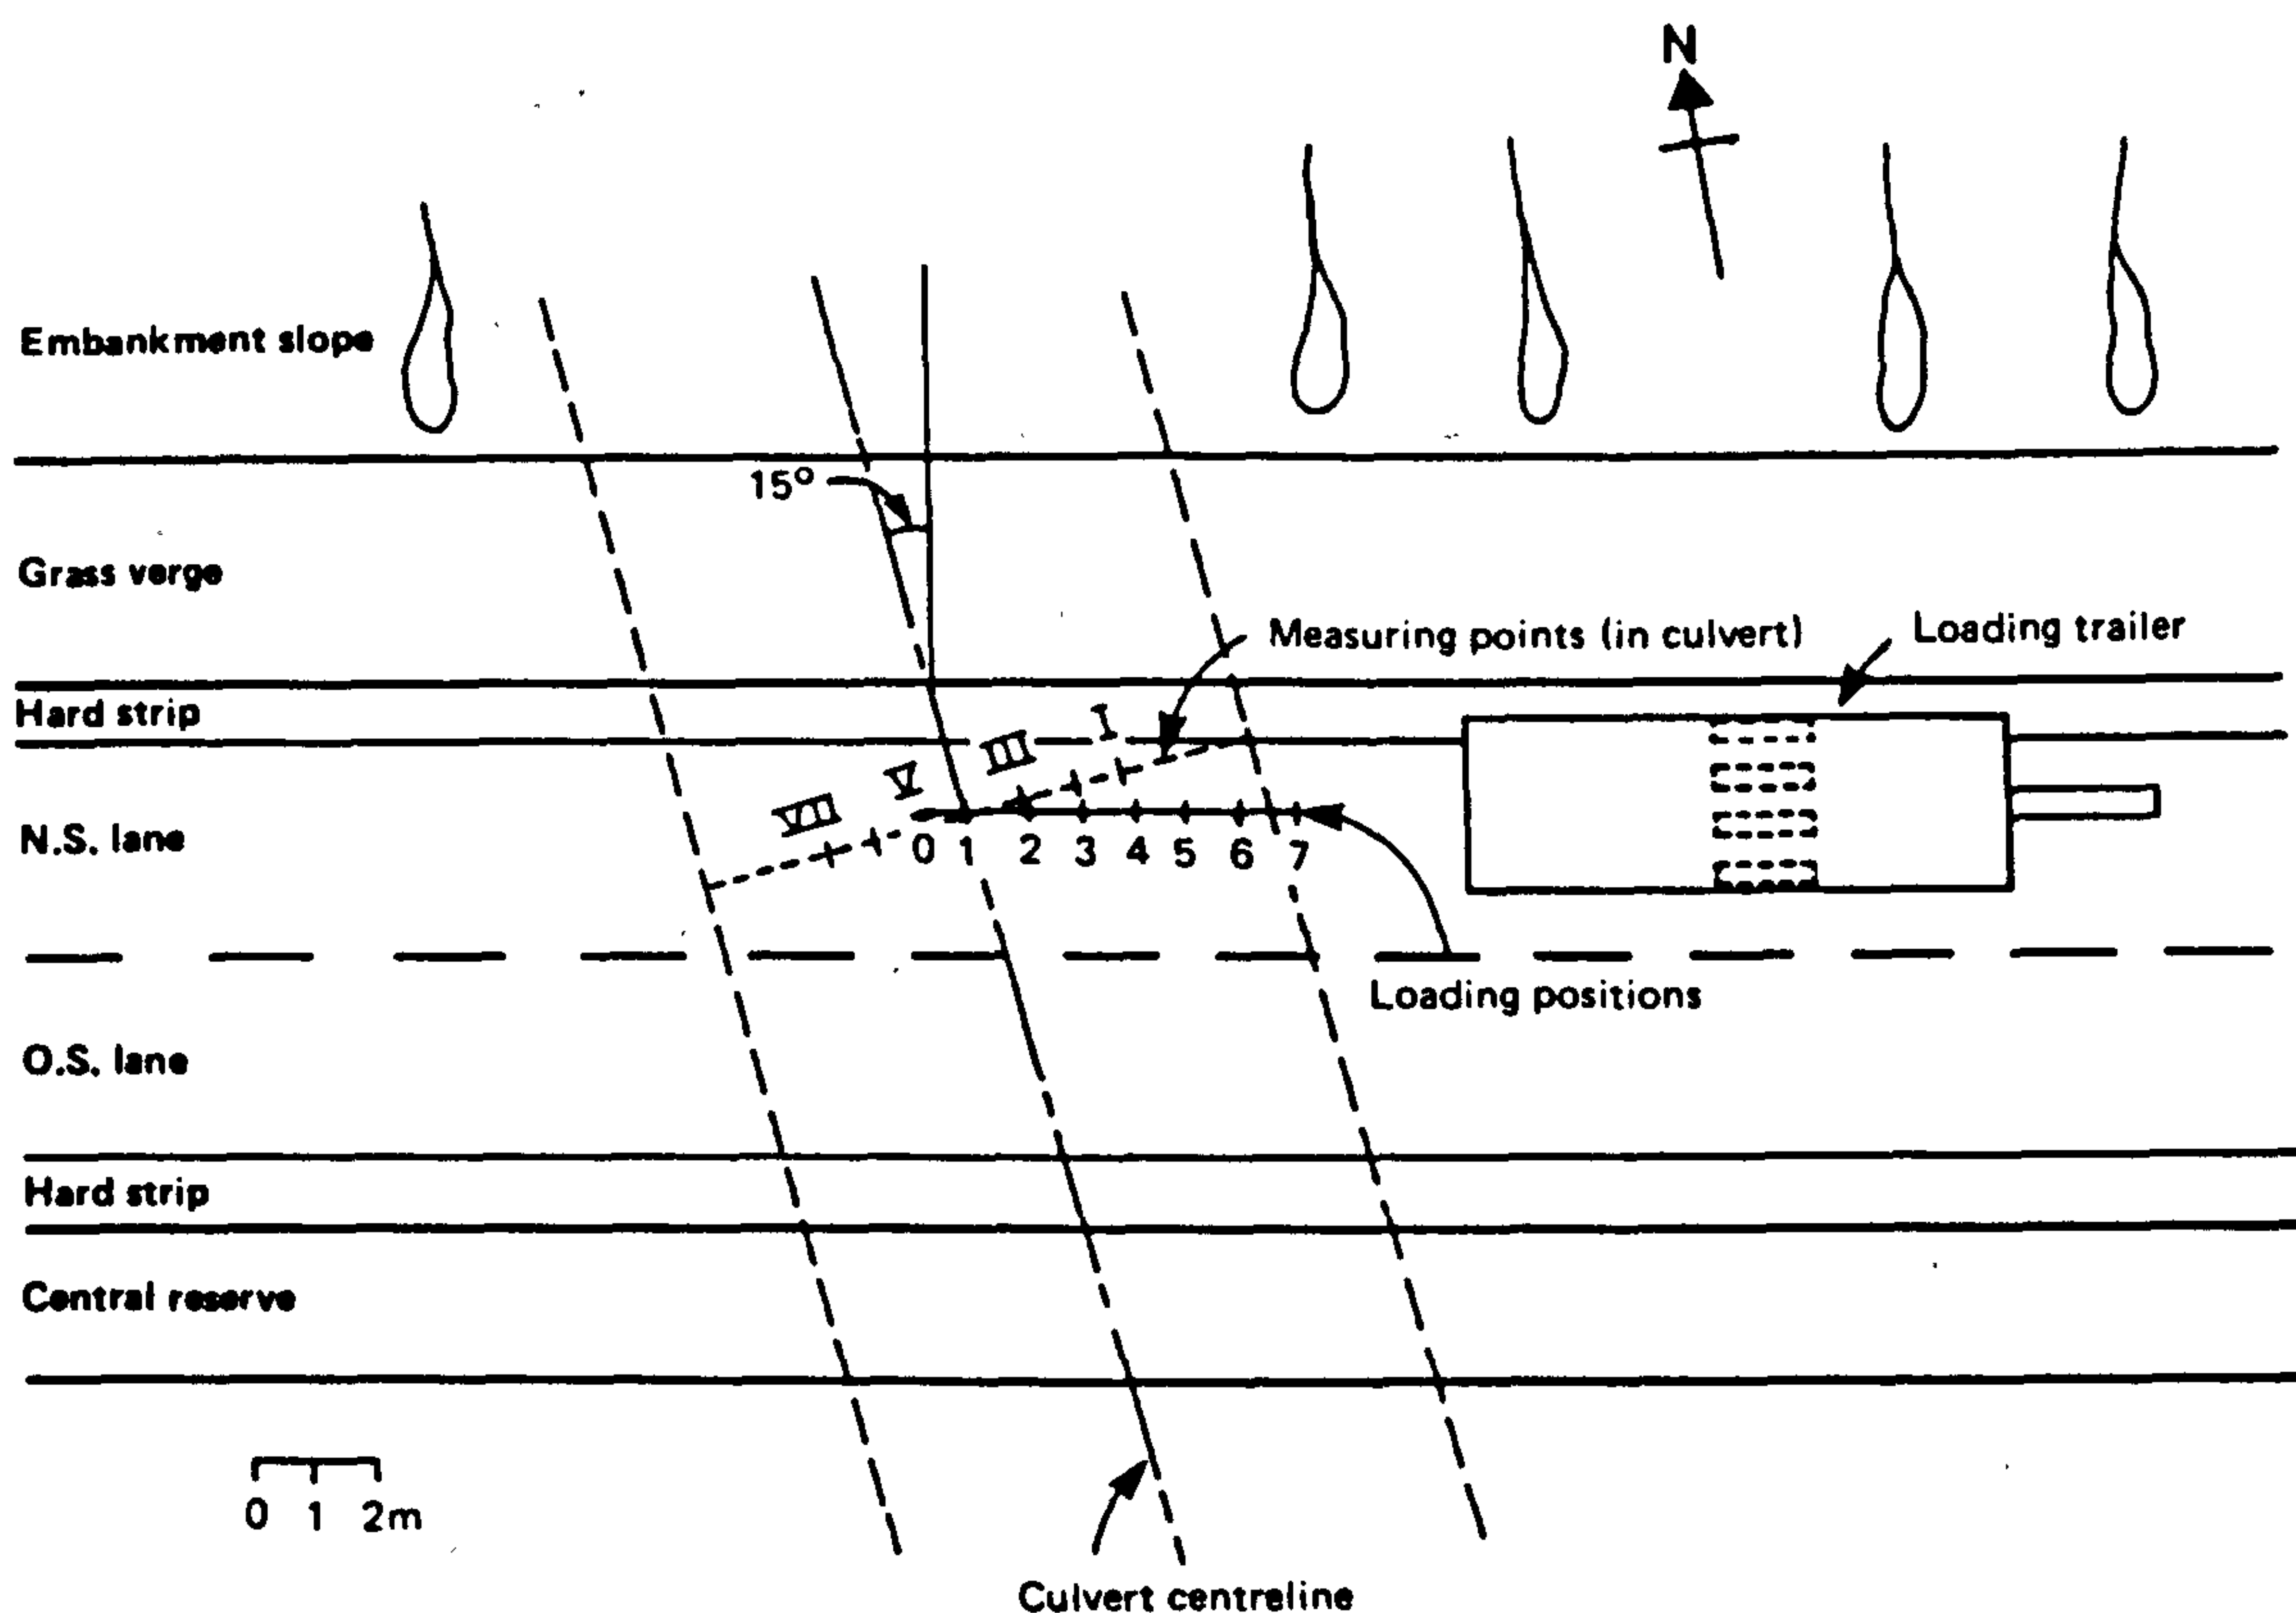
PLAN VIEW OF QUY WATER SITE SHOWING POSITION OF CULVERT RELATIVE TO CARRIAGEWAY (TEMPORAL AND JOHNSON, 1988)
